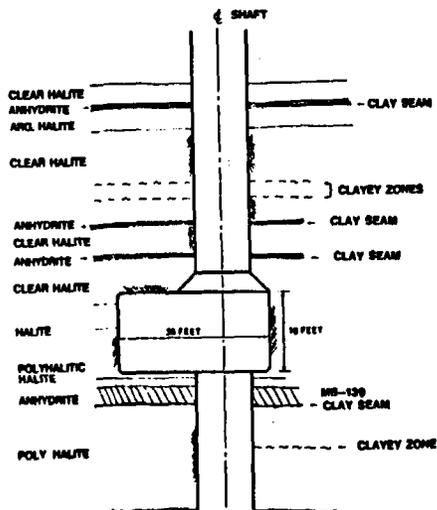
DISCONTINUITIES CAUSED BY CLAY SEAMS AROUND AN UNDERGROUND OPENING
